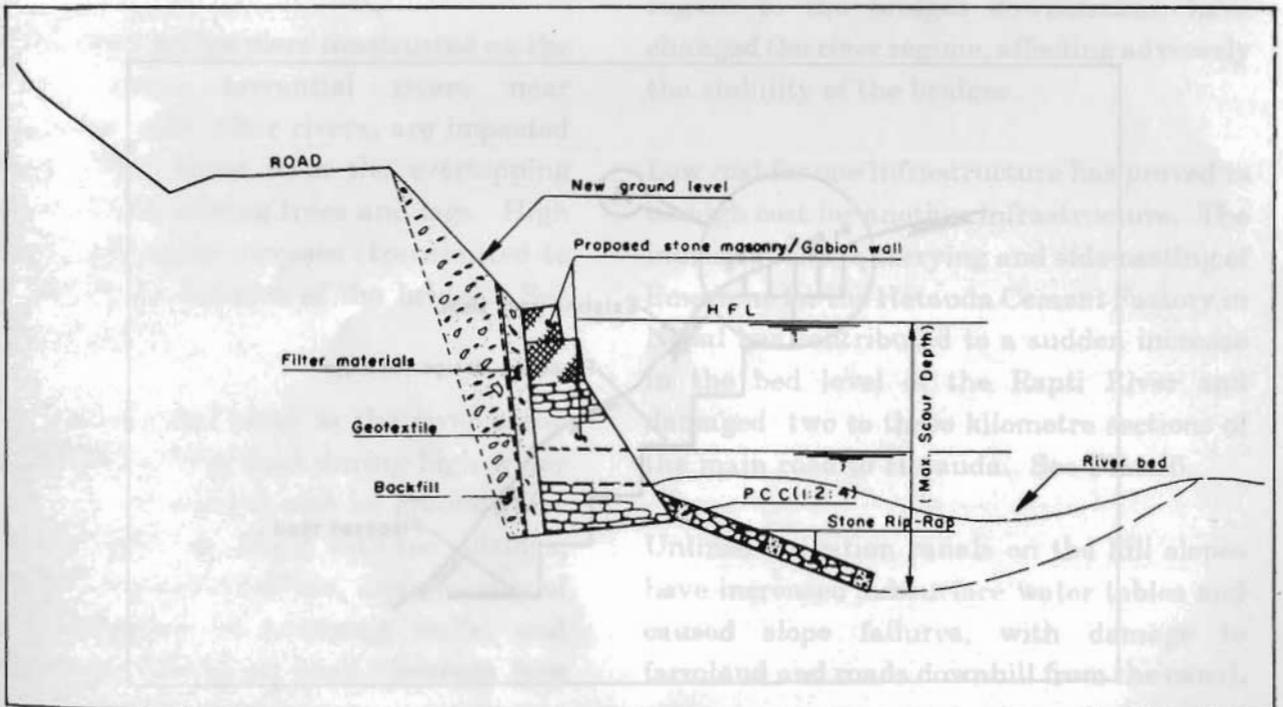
River training with proper backfill drainage, foundation depth, and apron
